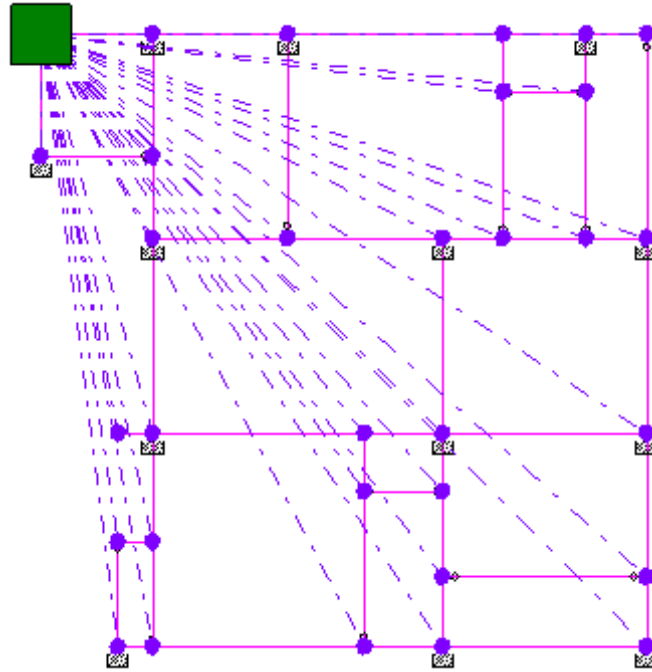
STAAD Model of Residential Building (with diaphragm) in Plan view
